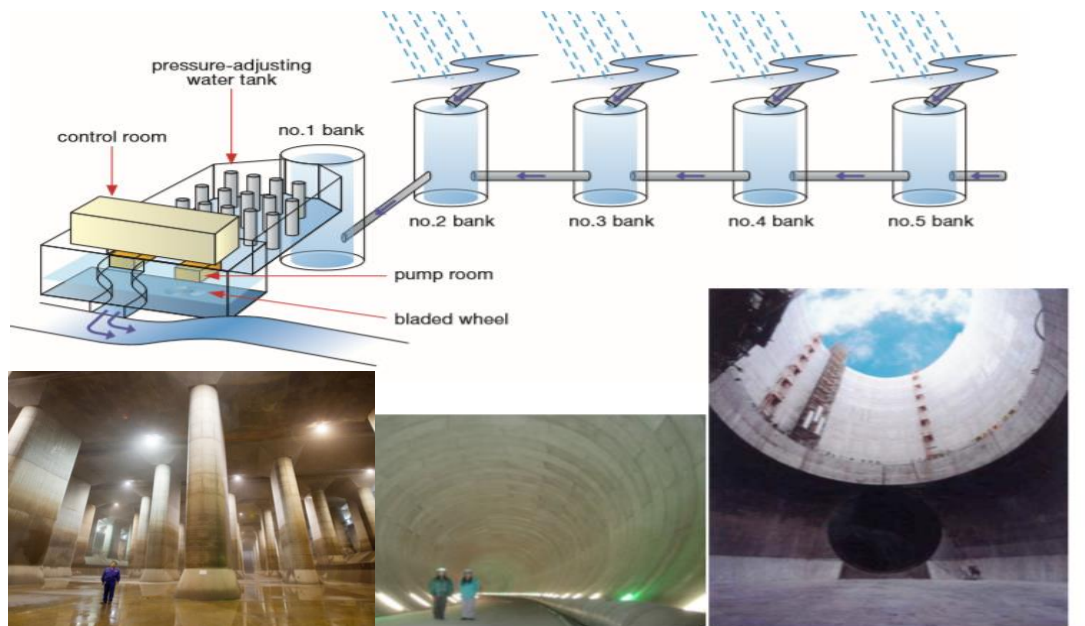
The Tokyo Metropolitan area outer underground discharge channel
